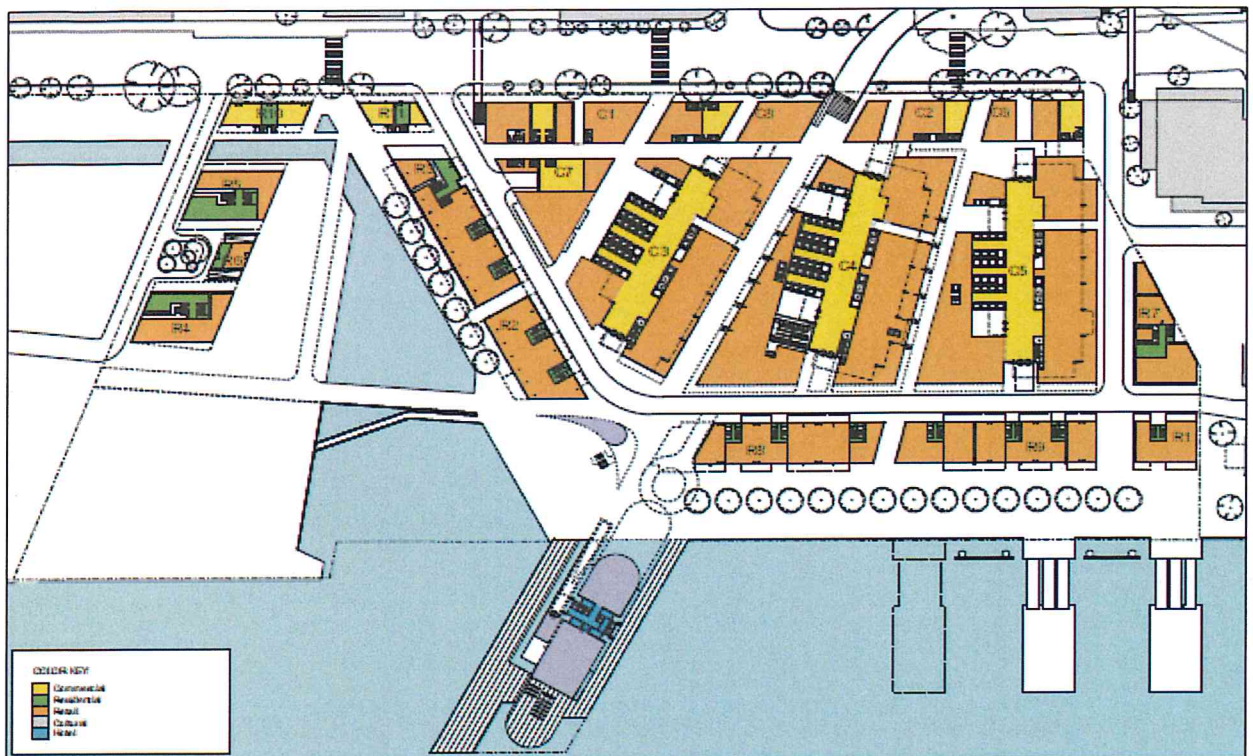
Ground floor layout of the approved blocks as approved under MOD 4
